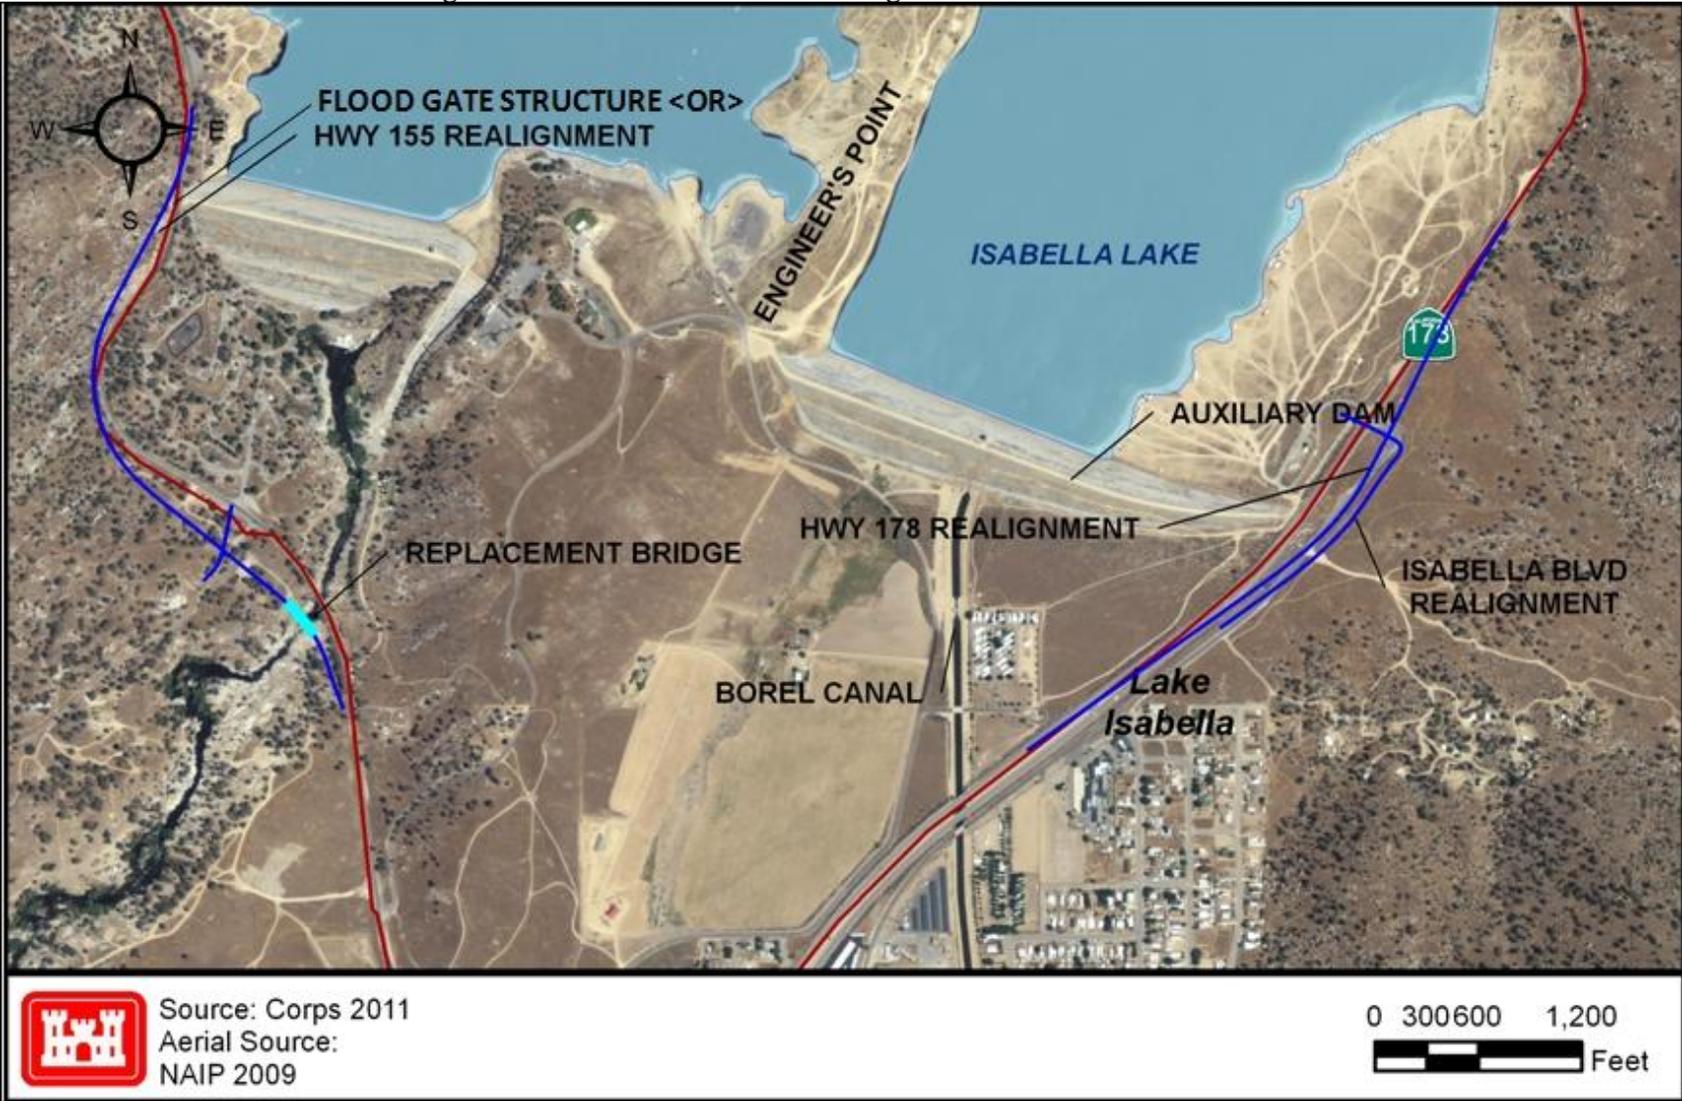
Potential Road Realignments for Alternative Plan 4
